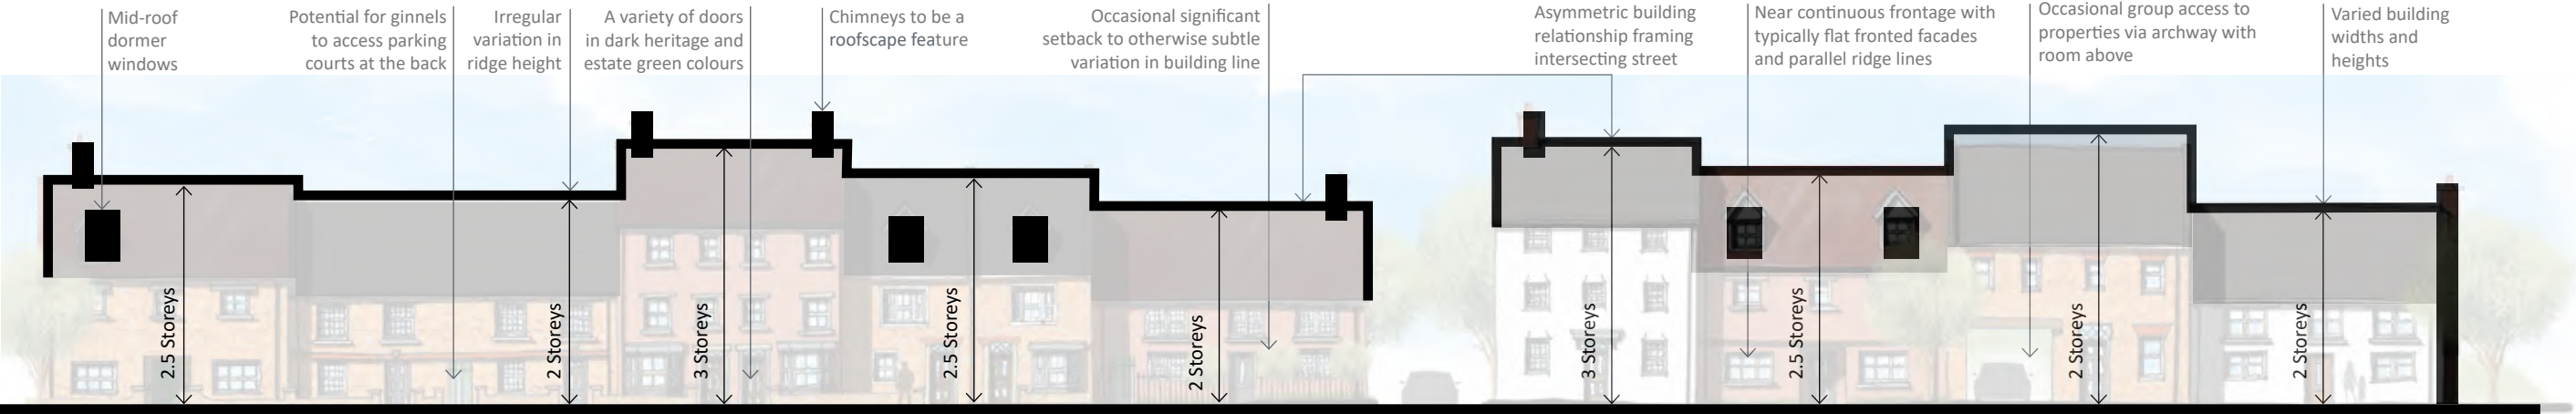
'HOT' STREET ELEVATION PRINCIPLES
